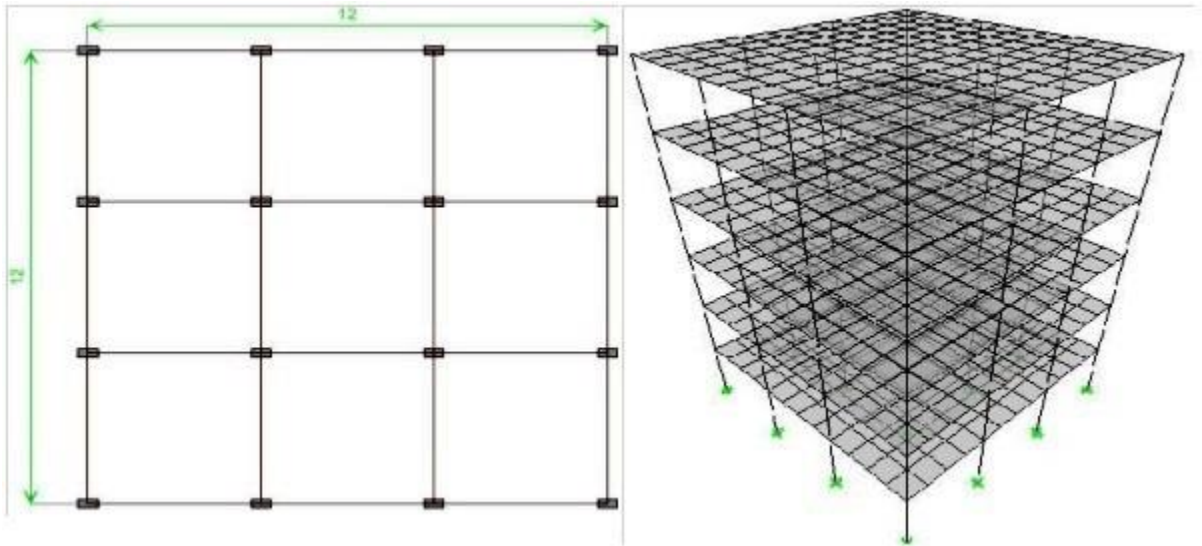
3: Building plan and frame (Santhosh. C et al (2016))
